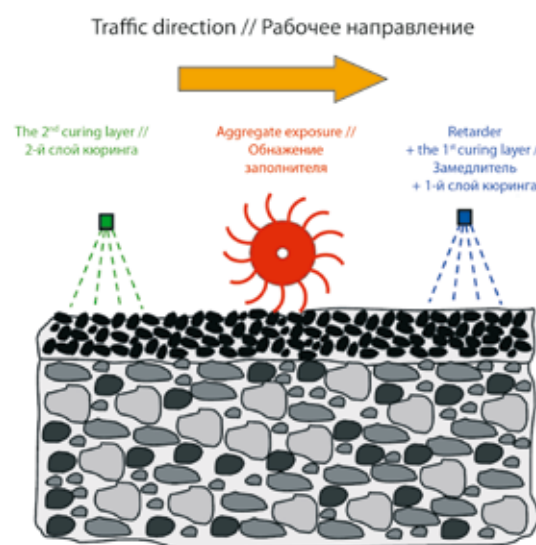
Structure diagram of two-layer cement concrete pavement based on the "waschbeton" technology
